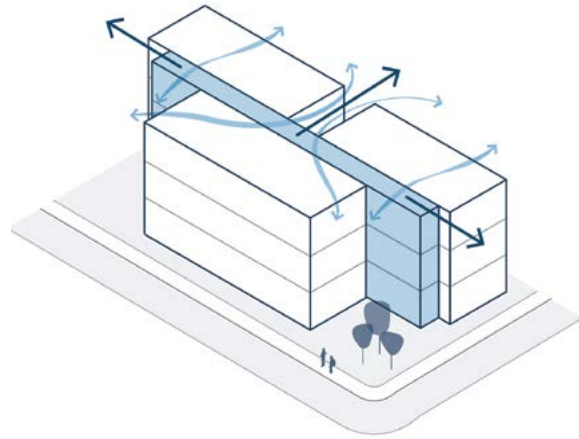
Breaking down building depth and massing to improve natural ventilation and access to daylight.
